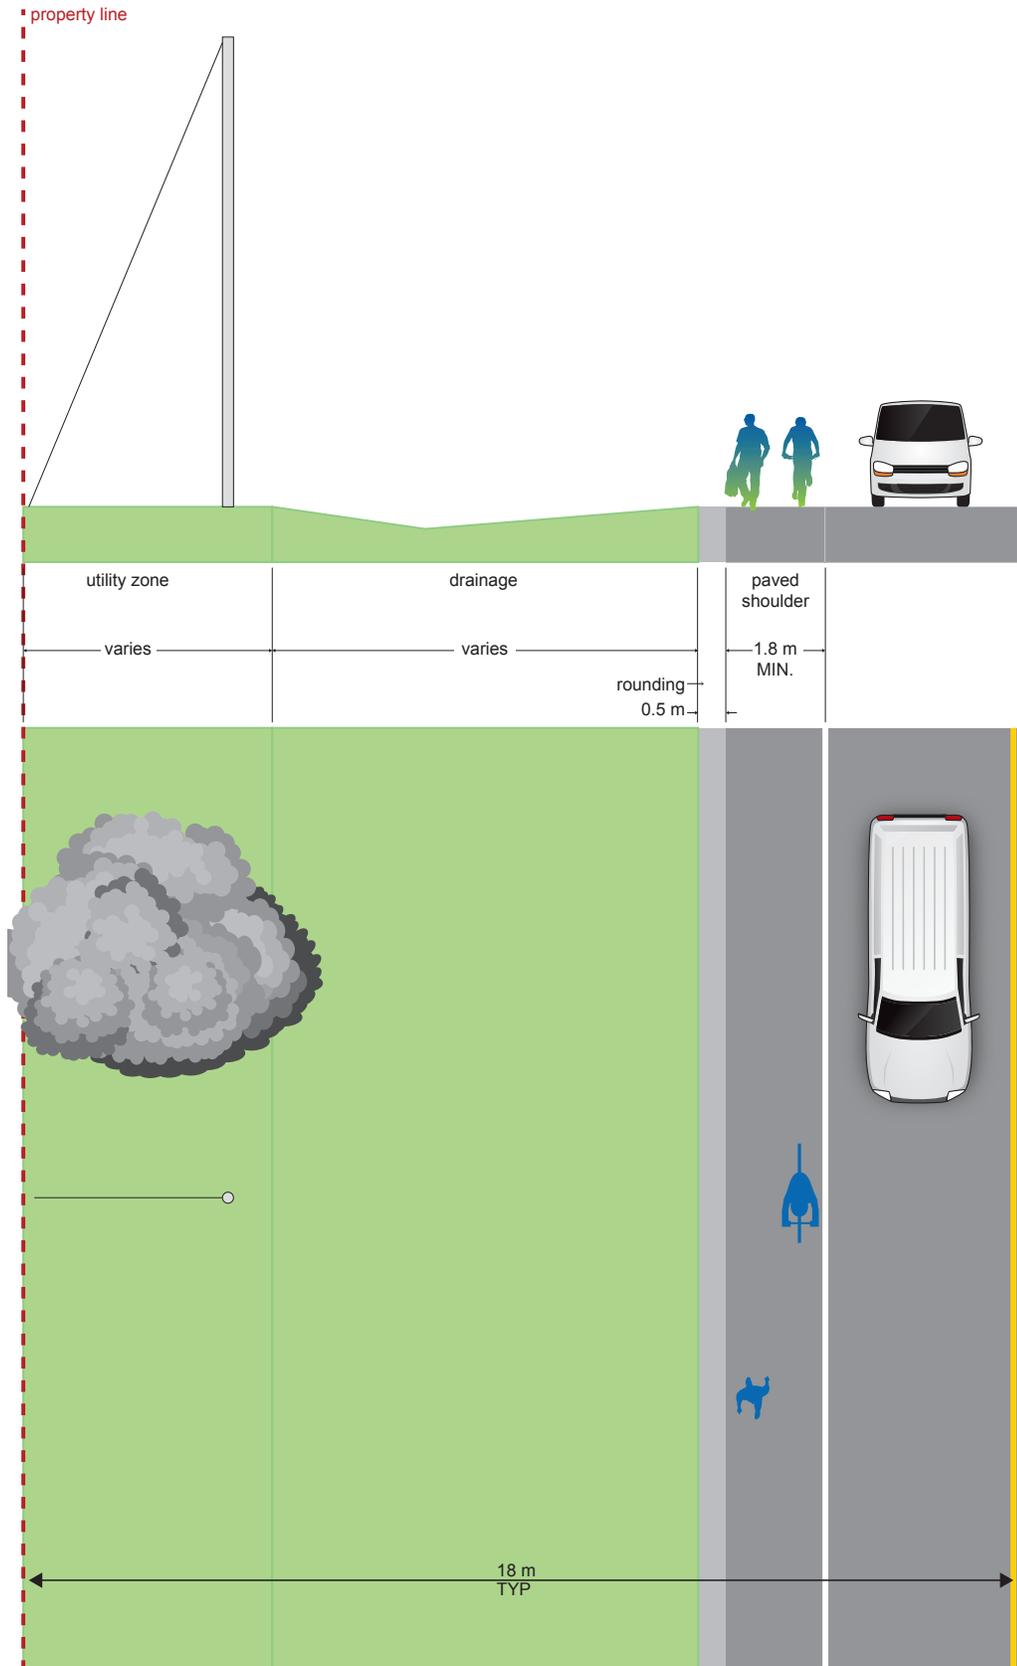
Retrofit (36 m ROW) – Paved shoulders installed on existing granular shoulders on rural roads with two travel lanes
